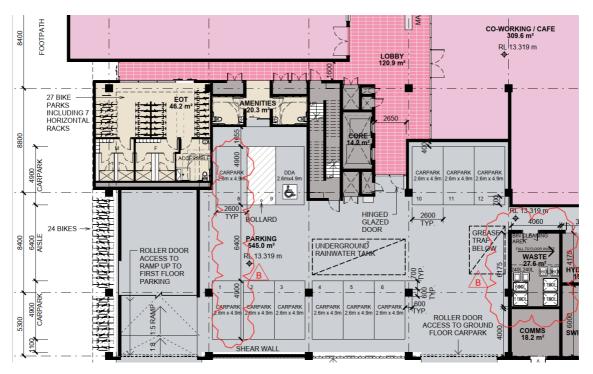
location of bicycle parking and EOT facilities, Source: North East Plot Building B Proposed Plan – Ground +L1(TP200 Rev B) by Six Degrees Pty Ltd
